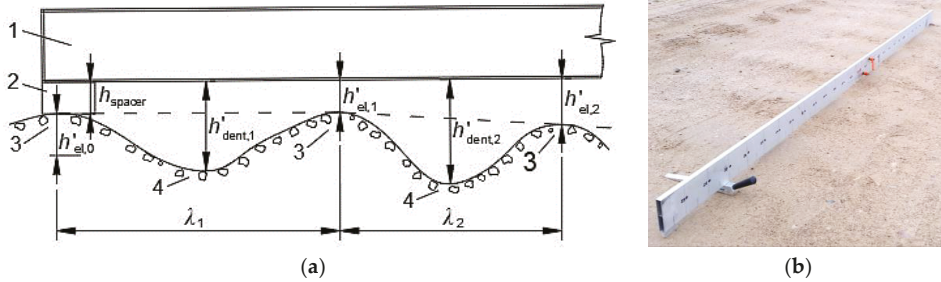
The measurement of gravel road roughness applying a straightedge: (a) schematic view, 1—straightedge of 3 m in length; 2—added spacer; 3—pavement elevation; 4—pavement dent; (b) measurement of gravel pavement.
